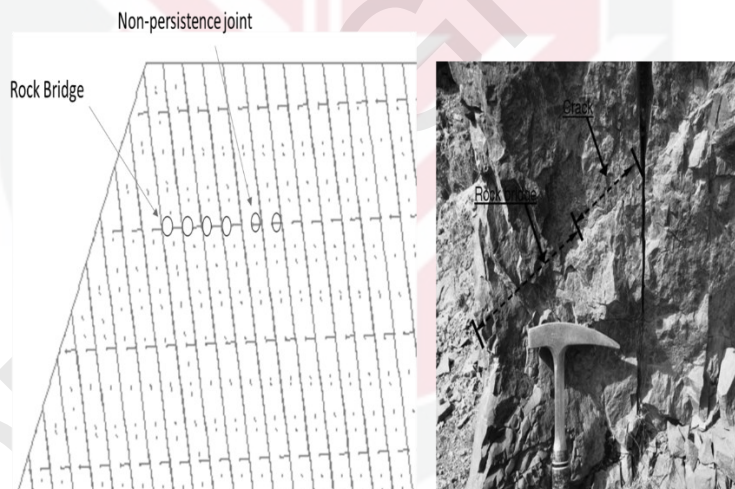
Definition of rock bridge and crack in a rock column poses the risk of flexural toppling
